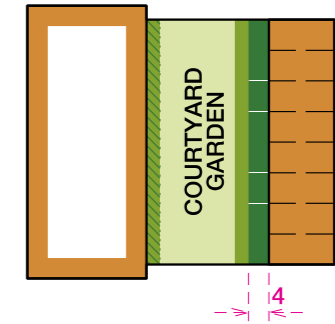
Plan diagram: First floor frontages behind Terraced Houses.
